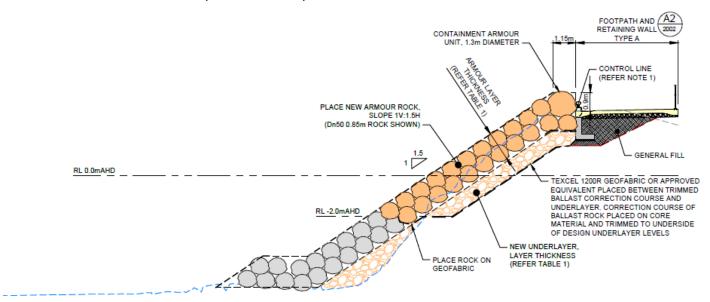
Step 3 – Place Upper Breakwall (Source: Royal Haskoning DHV)
